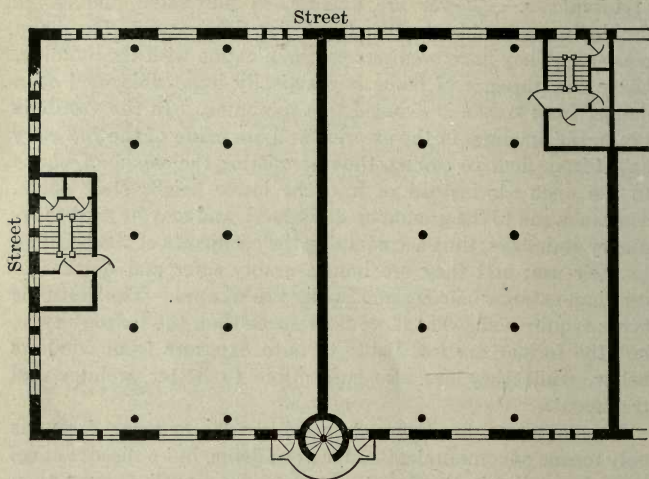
Hamburg Tower Stairs for Warehouses.
